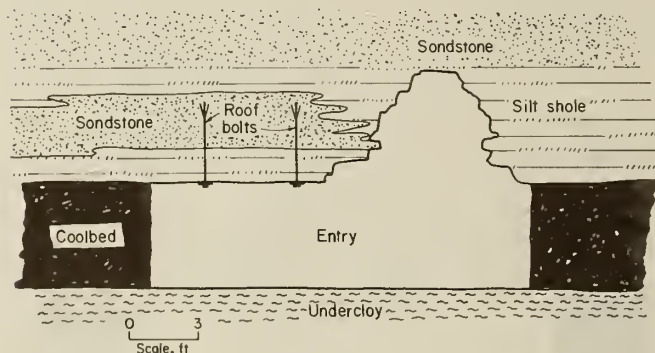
Subtype G_4 roof failure attributed to pinchouts.
